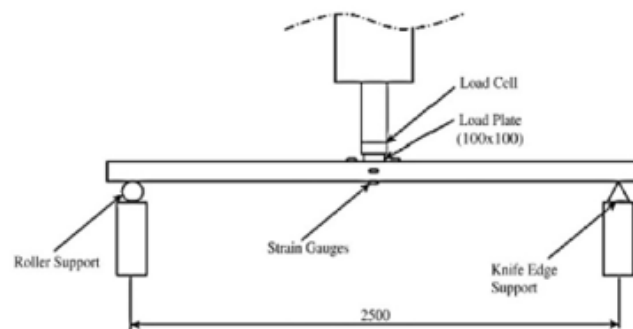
Schematic draft of experimental setup of the CFST specimen under impact load by Yousuf et al. [107].
